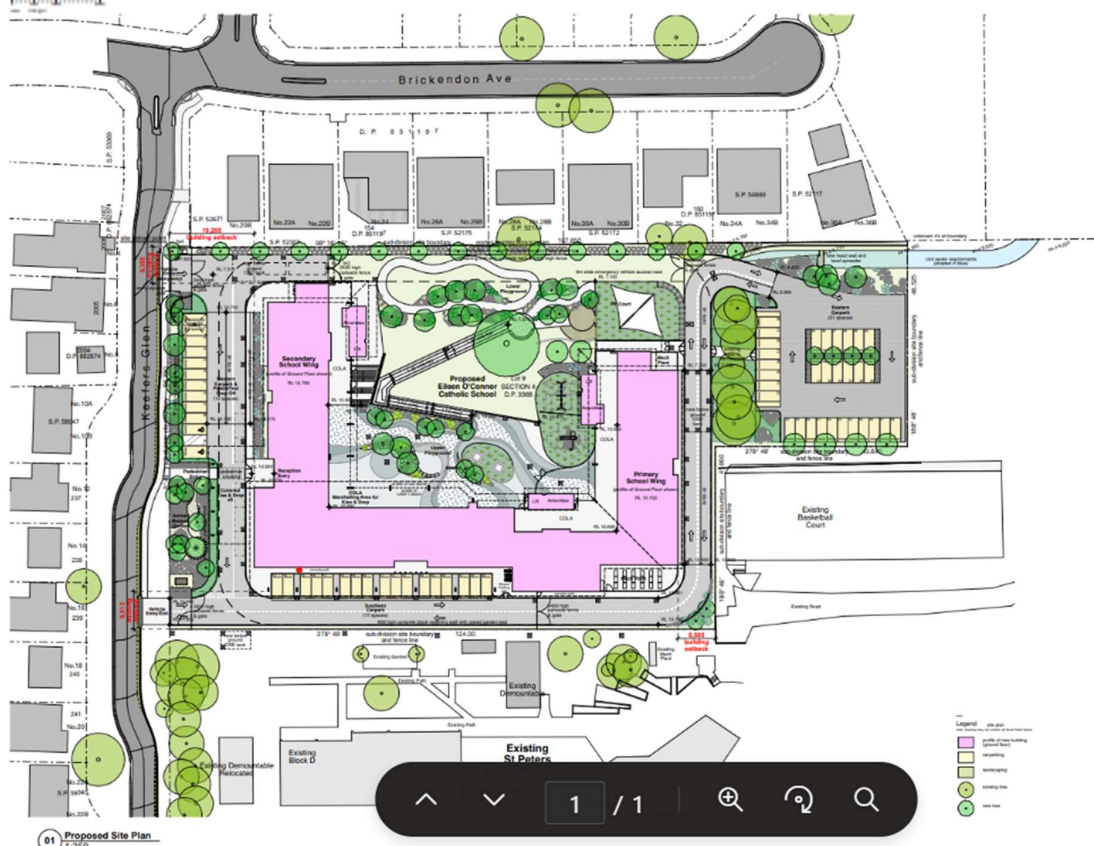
Proposed Site Plan. Source: Stanton Dahl Architects
